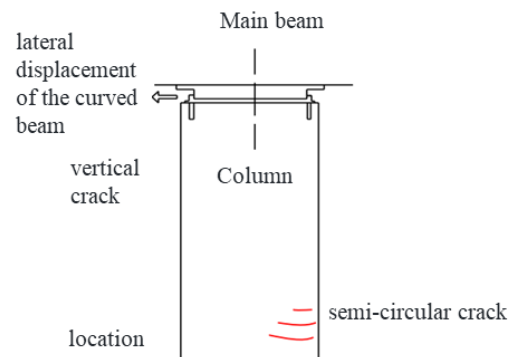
Schematic diagram of crack in bridge pier column
